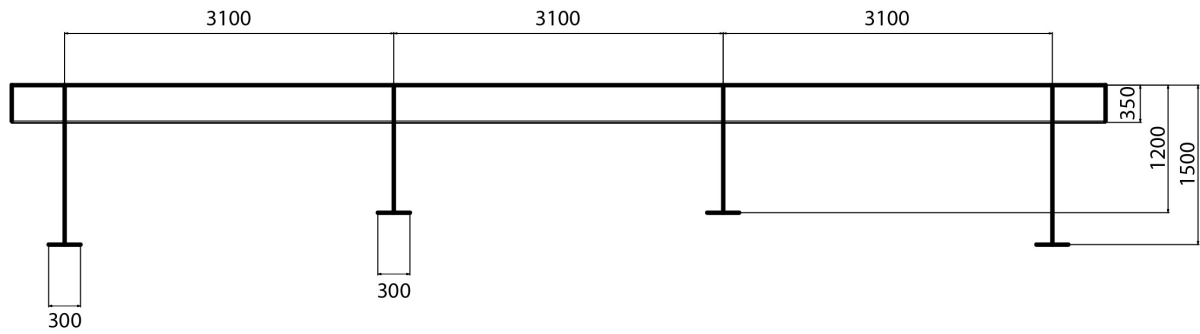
Dimensions bridge deck design. Side view (mm)
